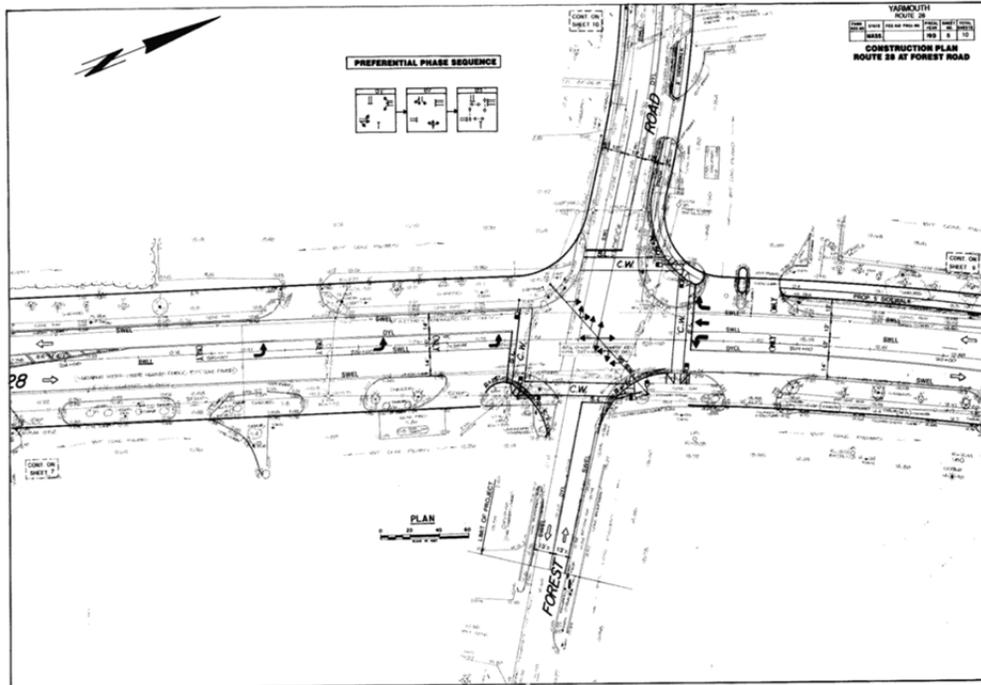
RT 28 AT FOREST: MASSACHUSETTS HIGHWAY DEPARTMENT'S 1992 DESIGN PLAN
